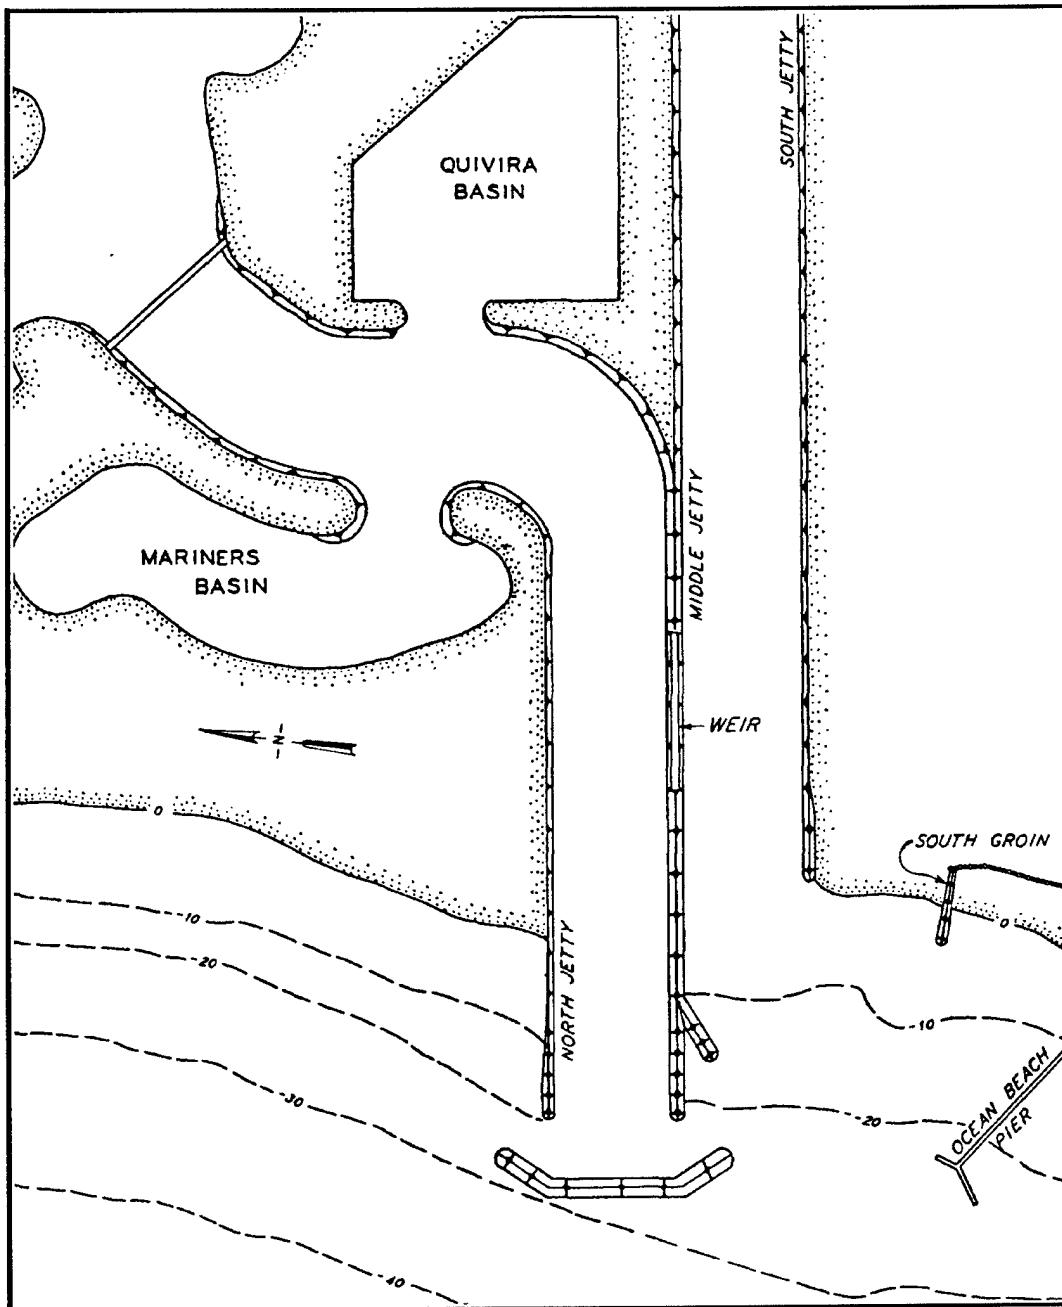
Improvement plan recommended for Mission Bay Harbor.
